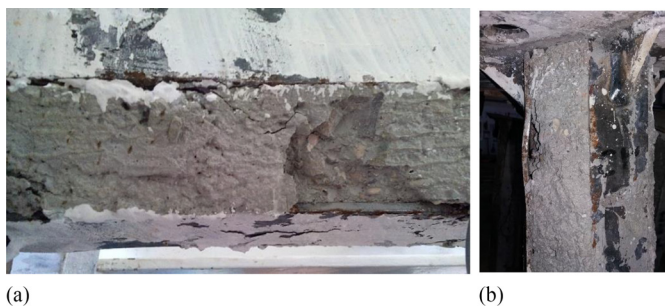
Buckling of flanges, crushing concrete, and fracturing and welds: (a) PEC-1; (b) PEC-2
